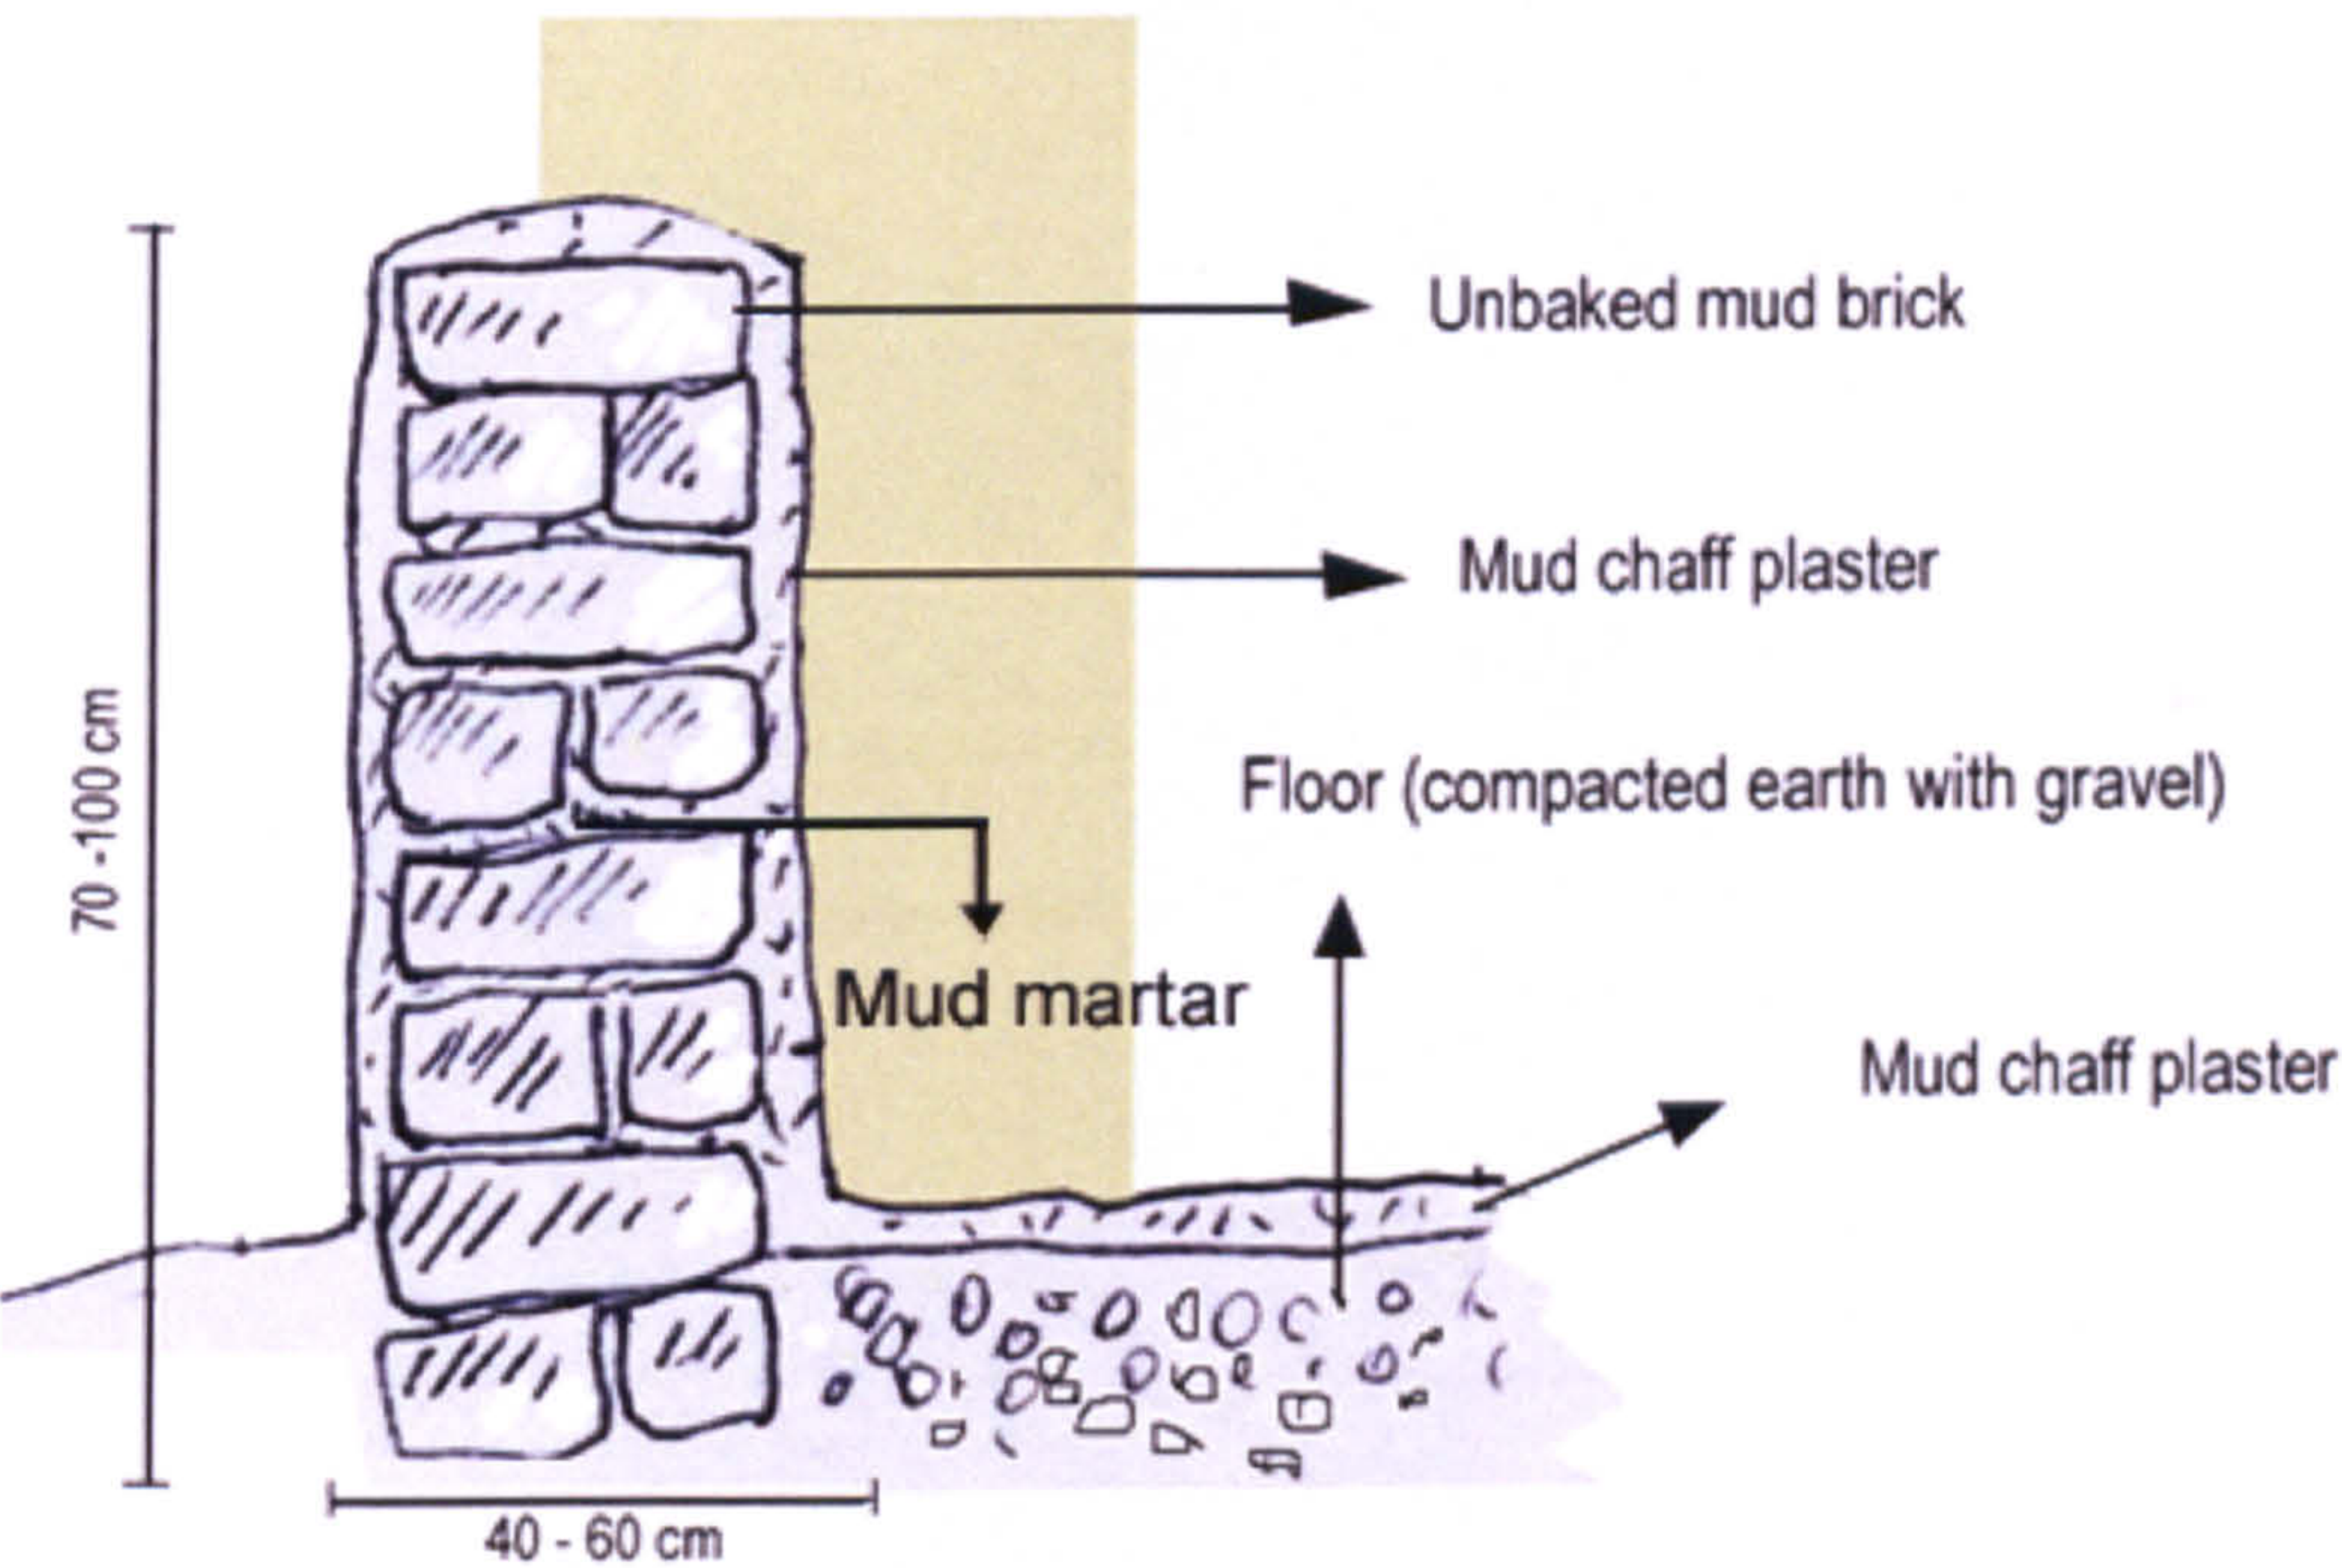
Mud brick method used by semi-nomadic people in the structure of temporary shelters in rural areas of Baluchistan. Source: Author
